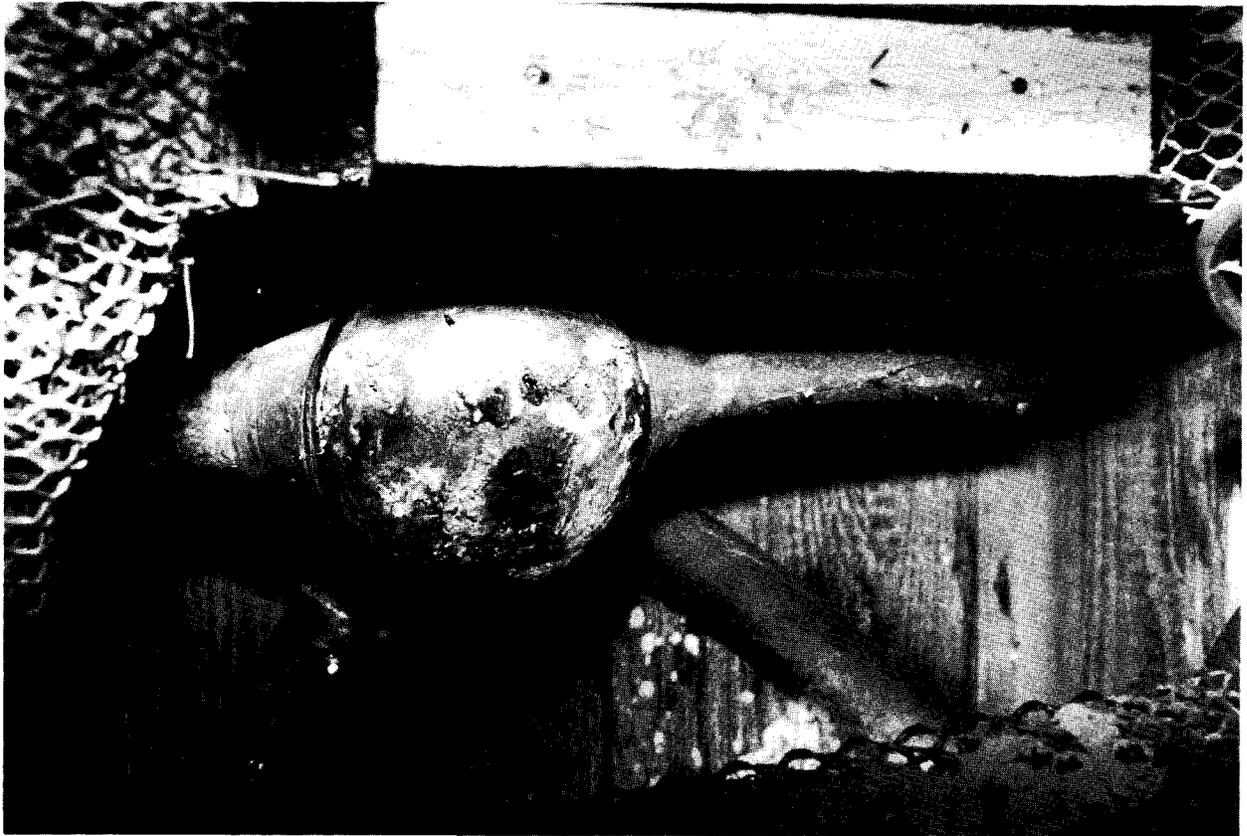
Penniman House: Back Hall (Room 105), Hole in Ceiling, Showing Drains of Bathroom Sink and Tub (1984).
